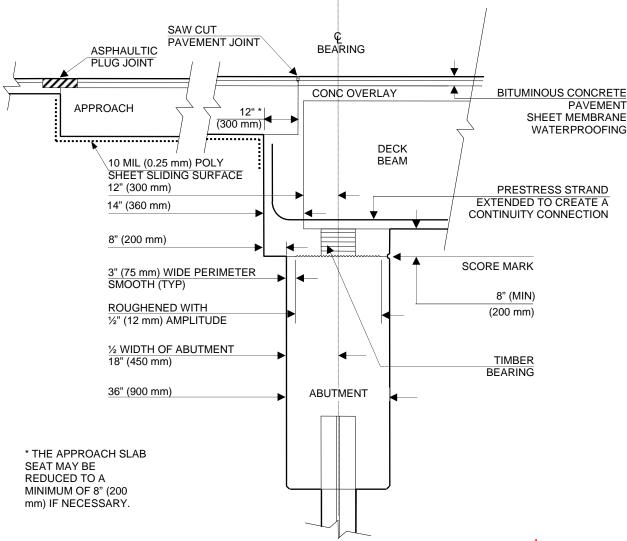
Bridge End Detail Type A (Prestressed Butted Deck Beam).
